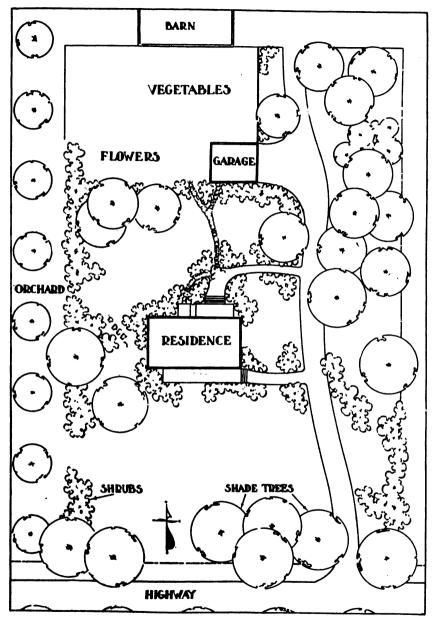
A design of walks, drives and plantings of a farm grounds where the buildings had already been placed.
